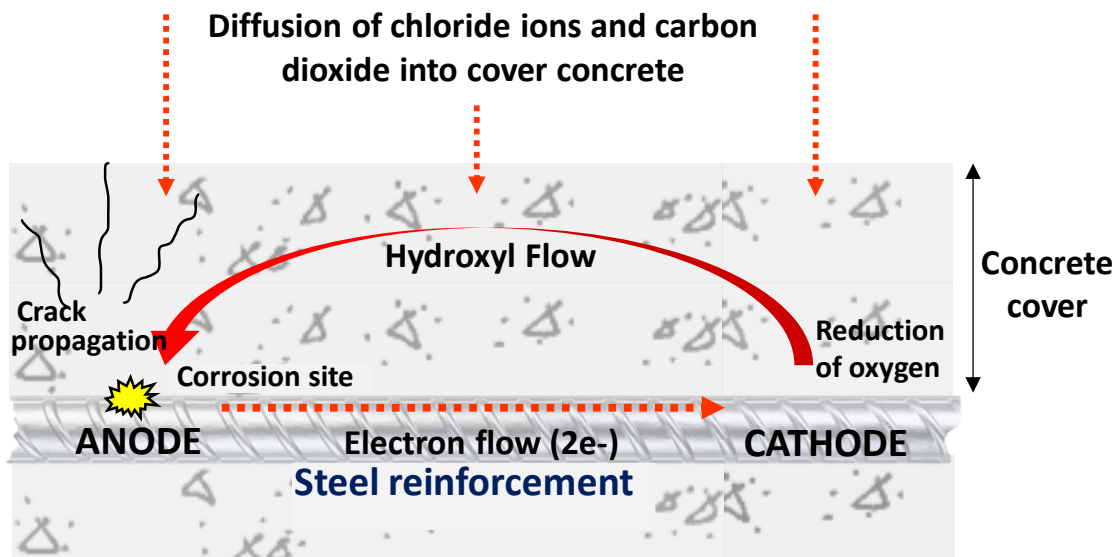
Schematic of corrosion of steel reinforcement (rebar) in concrete
